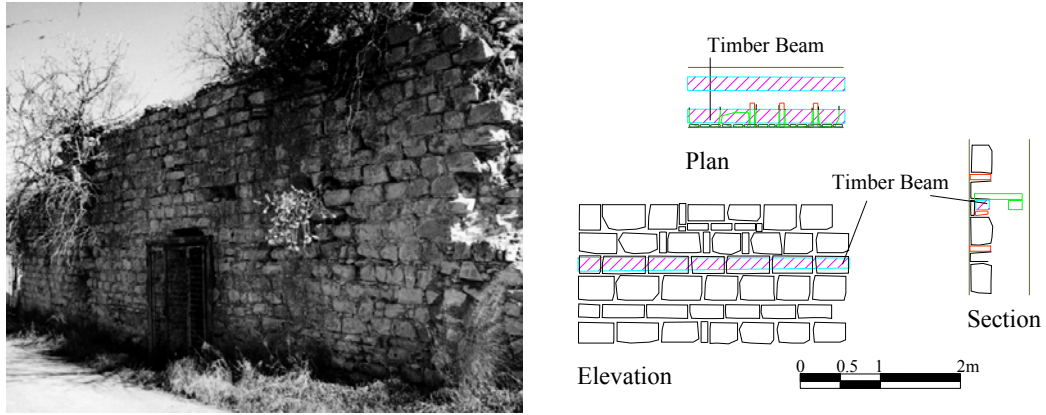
Kamanlı Hamamı, West elevation, Rough cut stone-brick alternating bond
